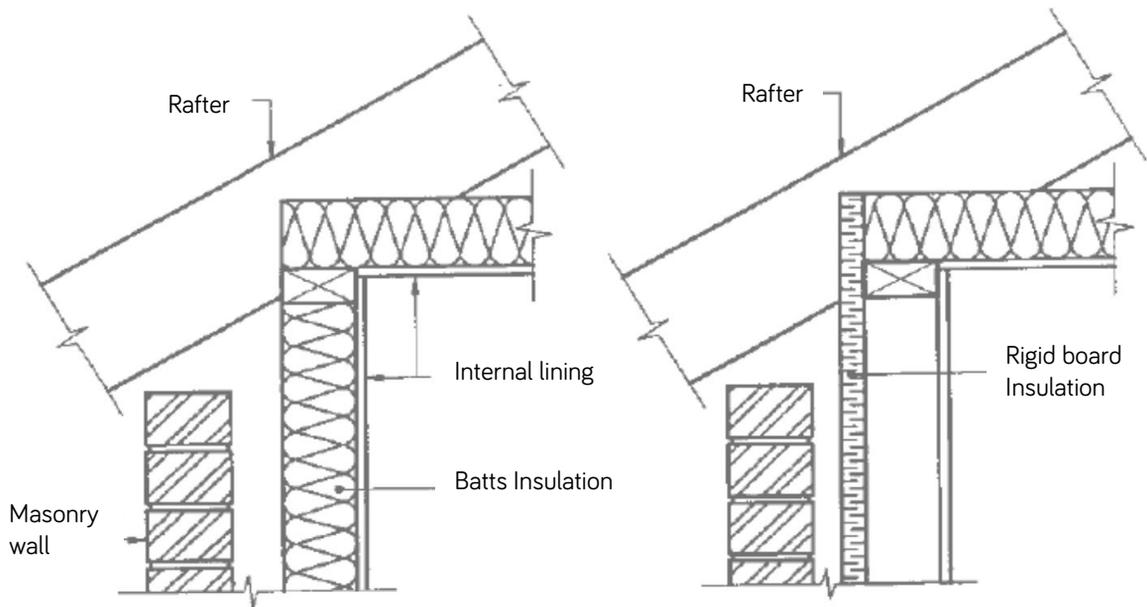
Placement of thermal insulation to eliminate thermal bridging.
